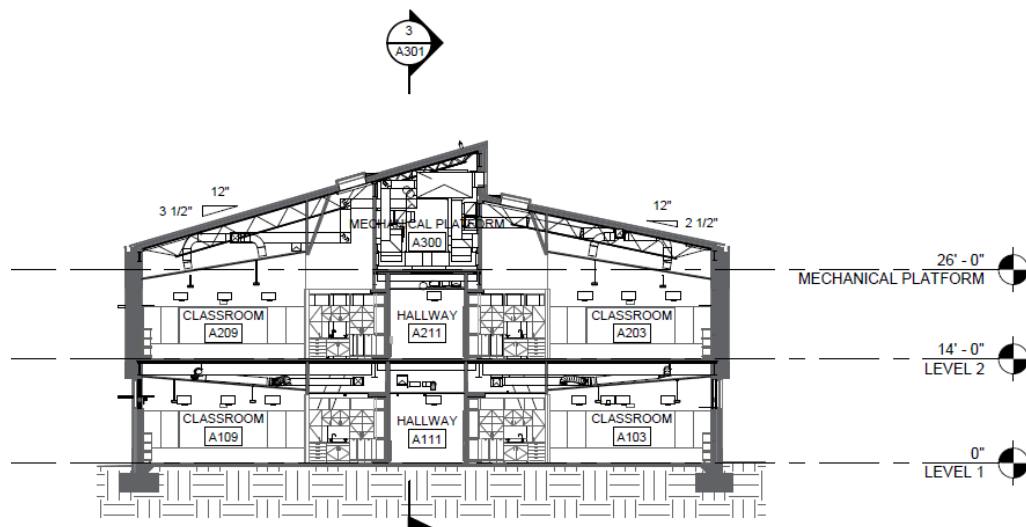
Building Section Classrooms (Provided by Pivot Architects)
